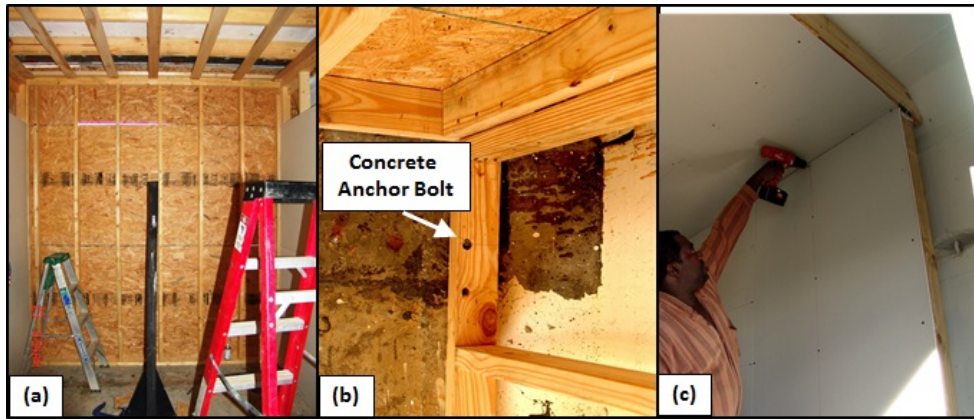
Conventional wood construction. (a) Dimensional lumber and plywood sheathing. (b) Concrete anchor bolts used to secure the lumber to the floor slab. (c) Sheetrock interior walls.
